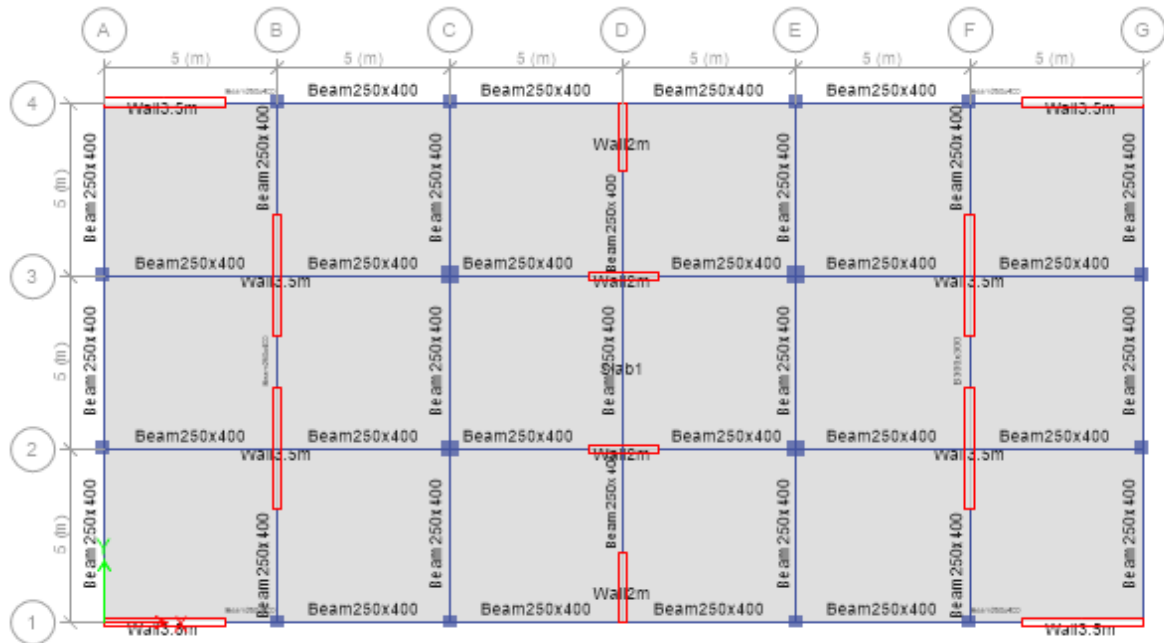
Floor Plan of a Building Model with 1% Shear Wall Ratio in Each Direction
